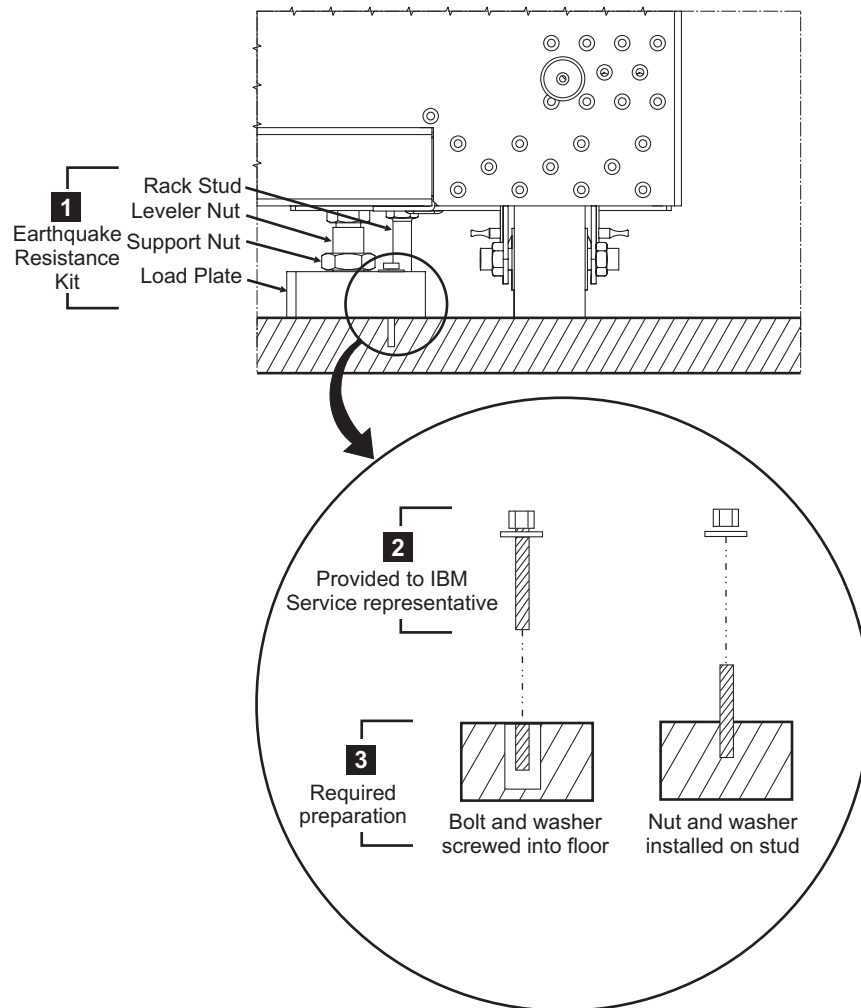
Locations for fastener installation (non-raised floor). Dimensions in millimeters (inches)
